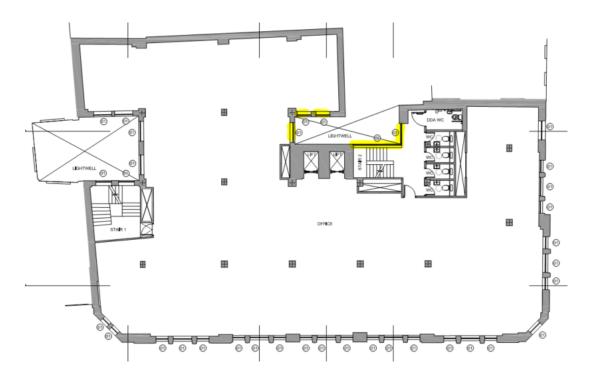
Typical floor plate at no.30 (taken from planning application ref. 2016/7076/P). East facing windows shown highlighted yellow.
